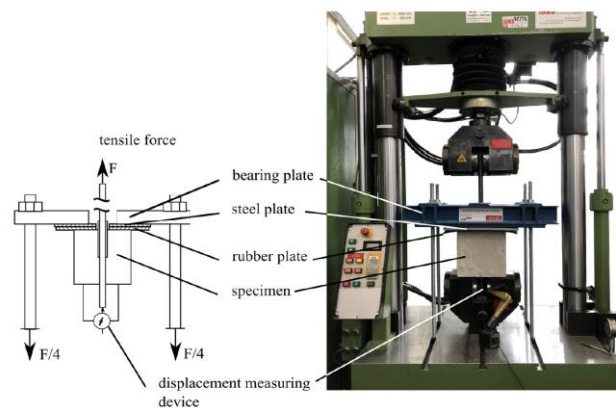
Scheme and photograph of testing setup for direct pull-out of reinforcement from concrete cube adapted from [2]
